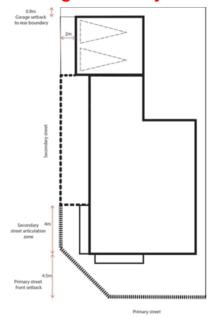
Secondary Street with garage access from Secondary Street (2m setback)
